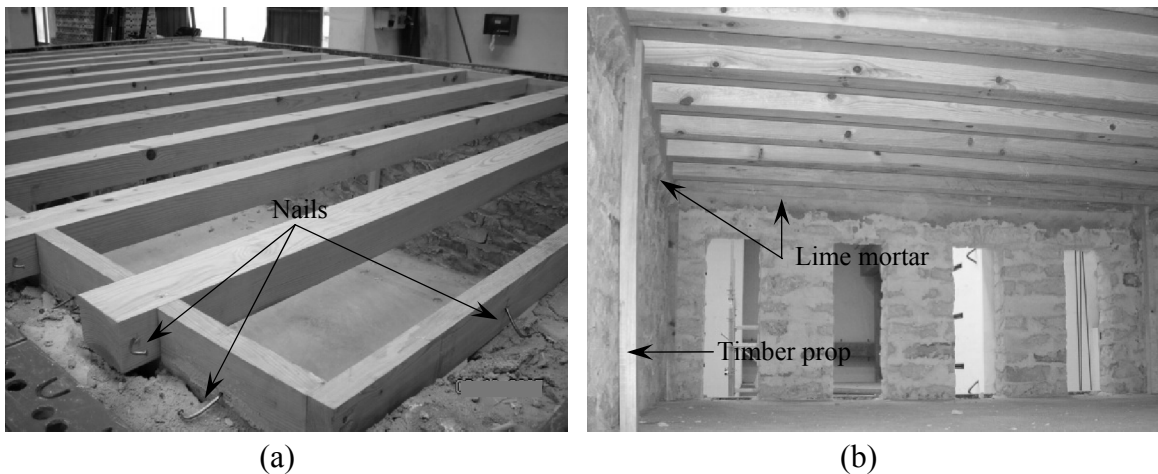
Details of the floors construction: (a) bent nails connecting the rim joists to the masonry walls; (b) timber prop and lime mortar used to fix the rim joists.
